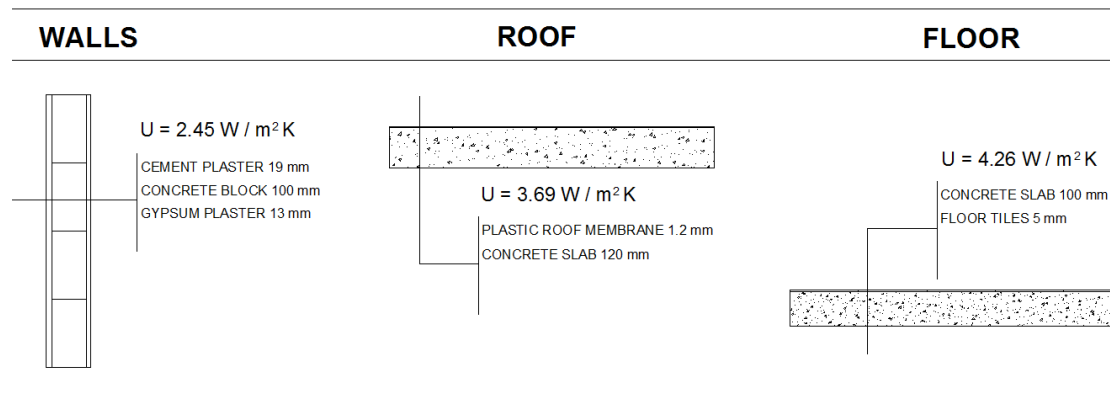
Wall, roof and floor construction of the heavy weight non-insulated building (reference).
